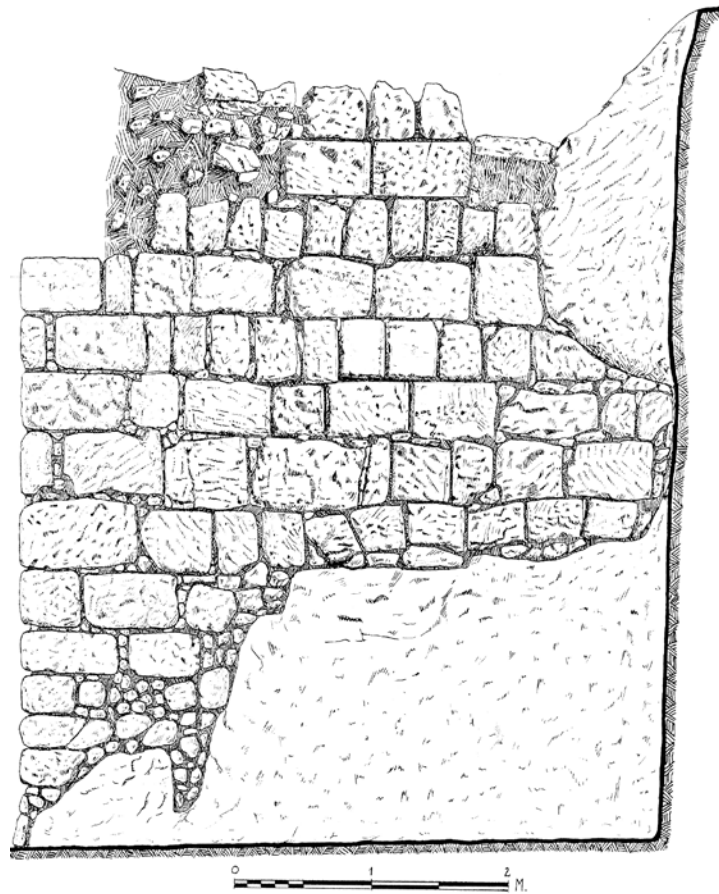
Elevation drawing of the wall associated with the gate excavated by Crowfoot.
